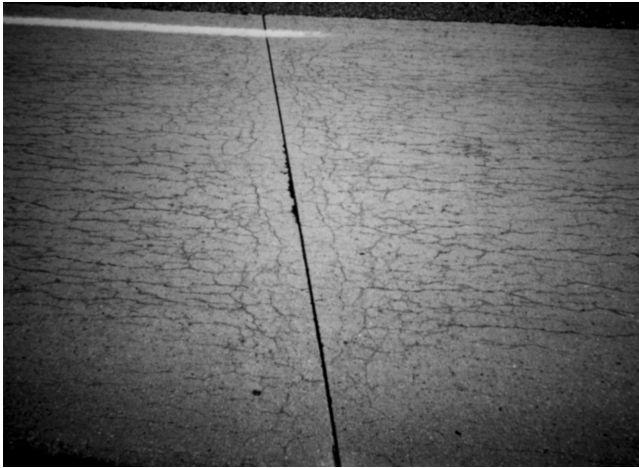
Photograph of pavement affected by ASR. Typical longitudinal cracking is parallel to the slab free edges, with additional transverse cracks in the areas near the transverse joints.
